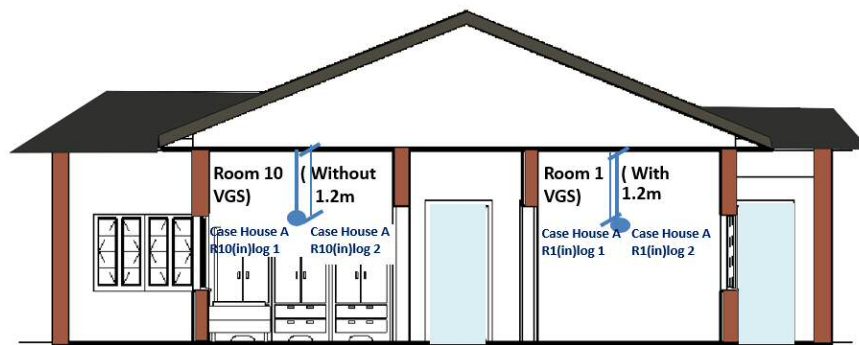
; Location of loggers in Room 10, in Case House A, source: Author, 2014
